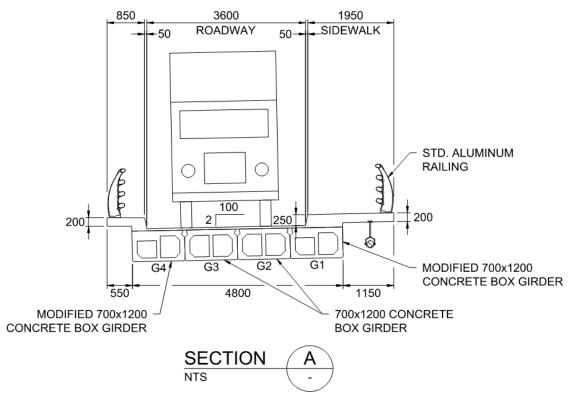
Isleview Place Bridge over Alberta Creek (Lower) - Section
